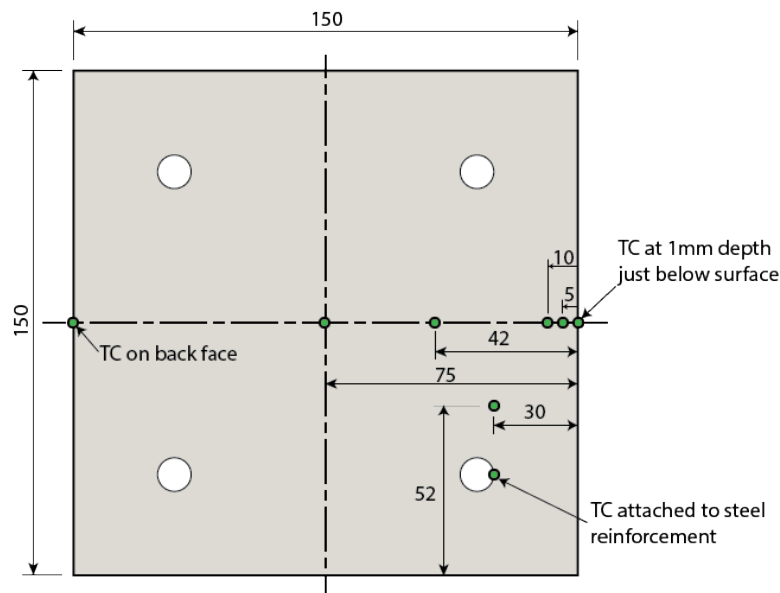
Plan of the location of thermocouples (TC) cast into concrete columns
